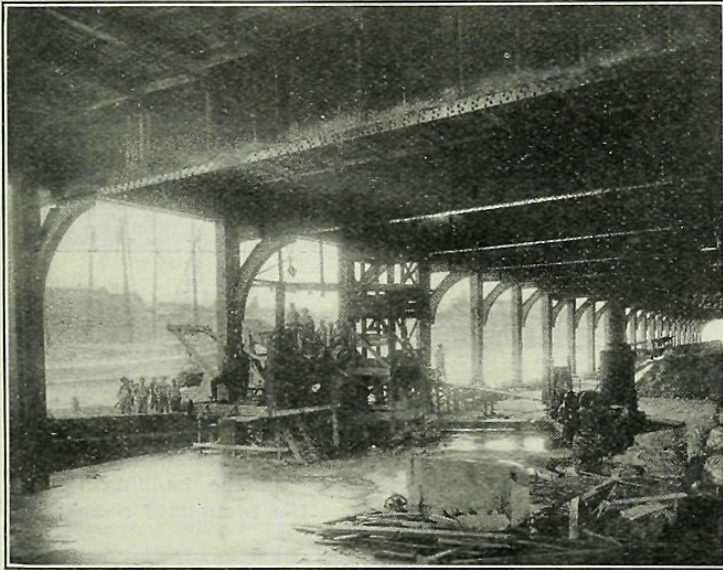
CONCRETE MIXER ON EDGE OF PIER NEAR LIGHTER WITH TRAPROCK.
